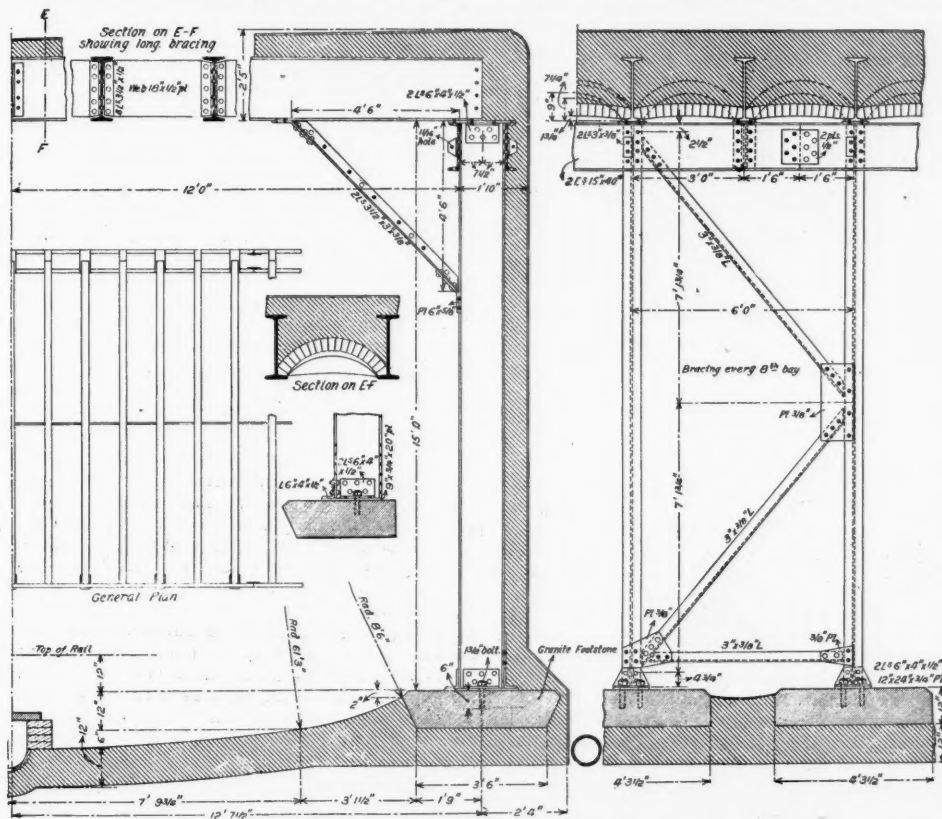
Half Cross Section and Longitudinal Section of Two-Track Subway.
